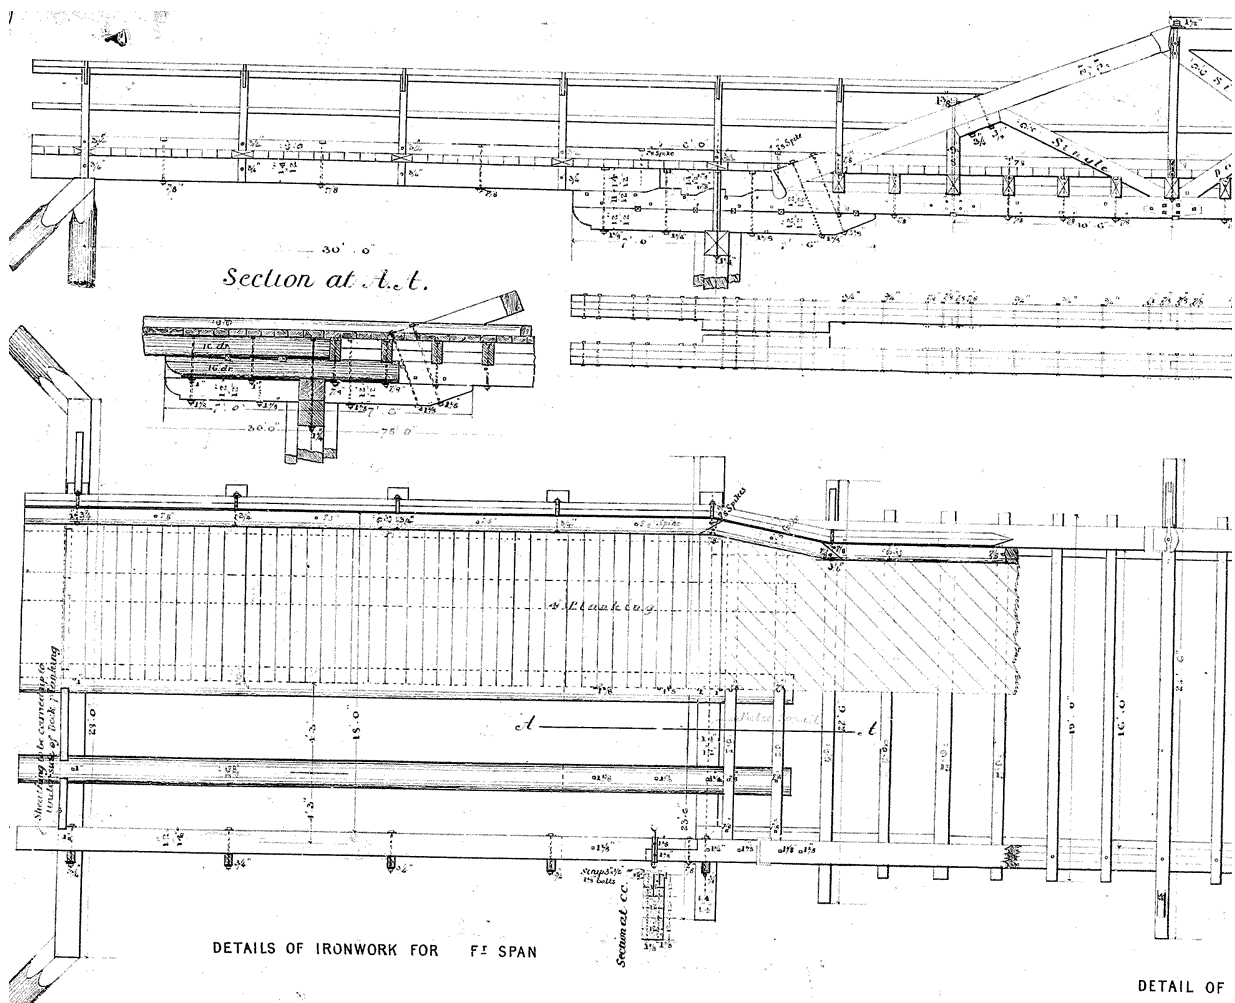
Continuity from principal to butting block to approach span girder to abutment.
